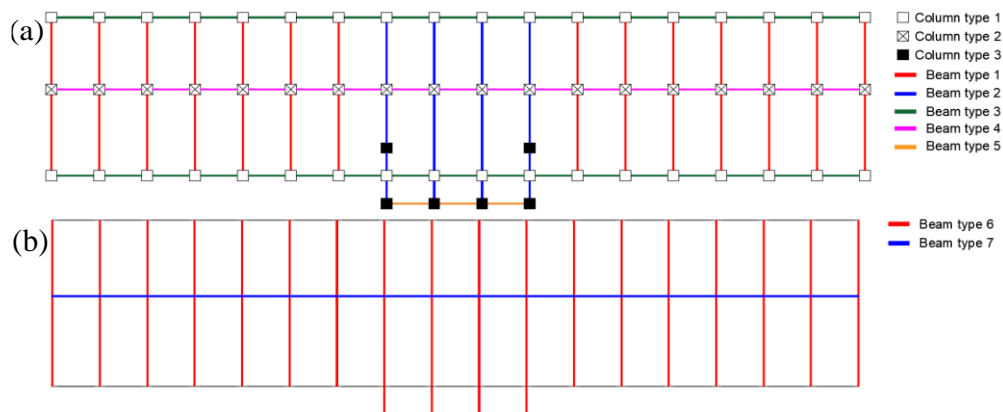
Characterization of beams and columns within the RC structure [26]: (a) typical story; (b) roof.
